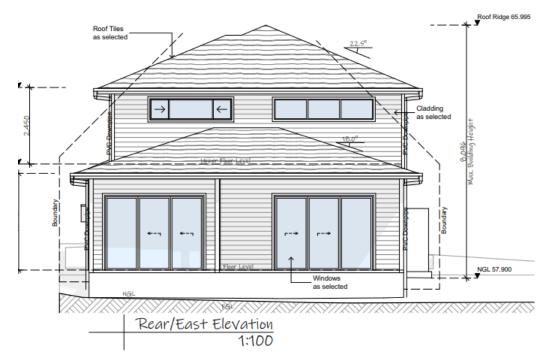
Plan Extract – Rear/East Elevation illustrating building envelope breach
